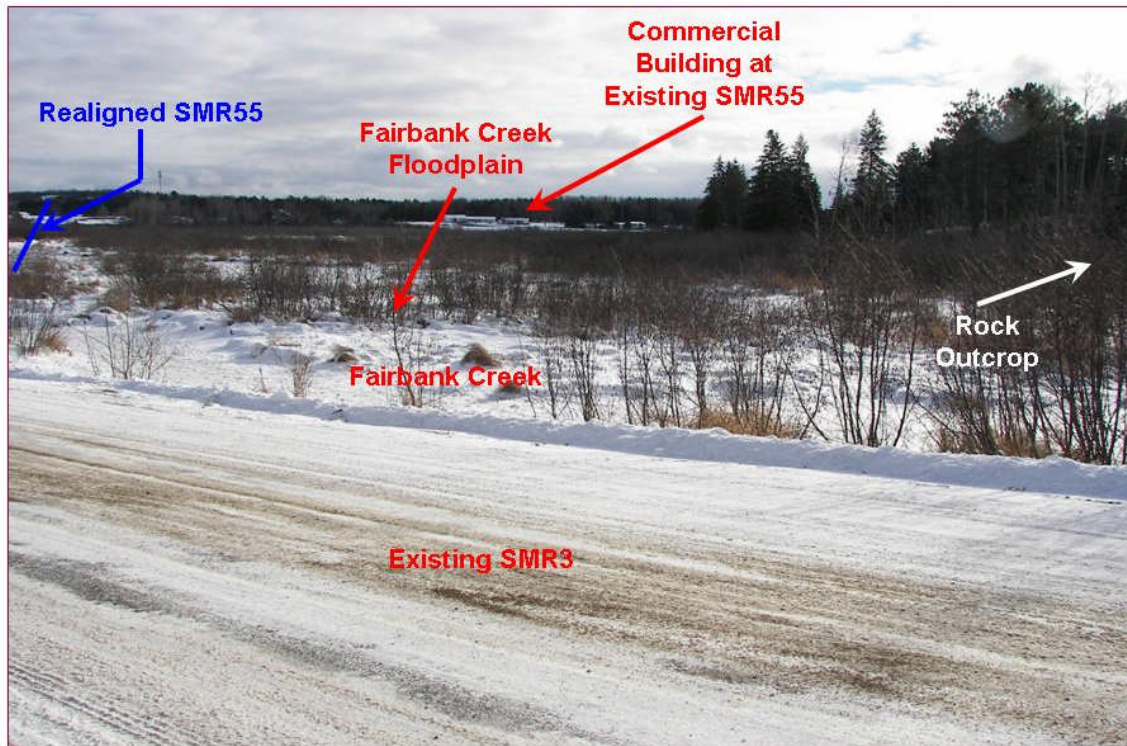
VIEW: Looking northwest from north shoulder of SMR3 at proposed crossing of existing SMR3 and realigned SMR55. Sloping farmland in foreground with bedrock outcrops in forested bush in distance. (Dec. 6, 2007)
